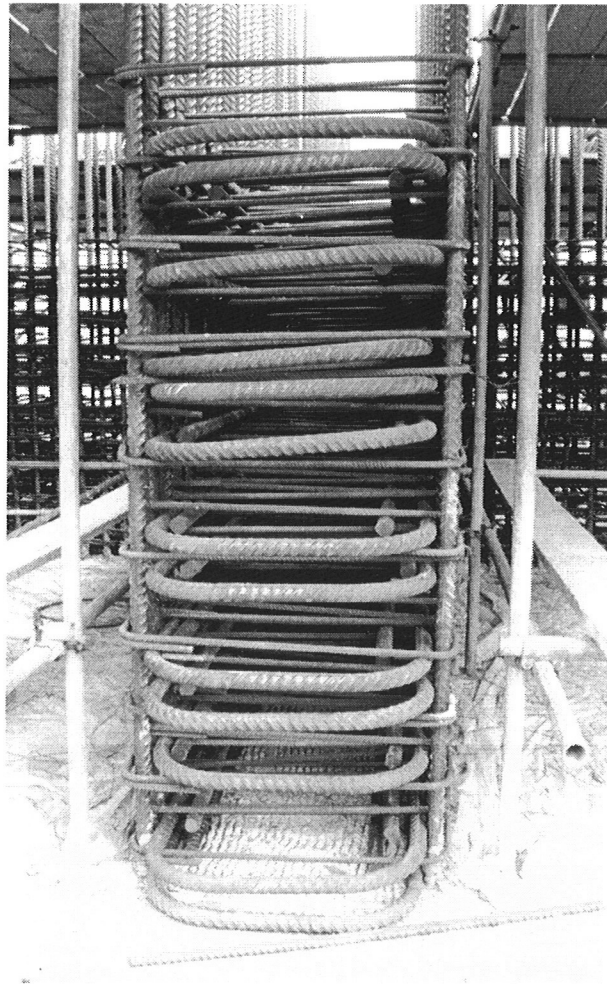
Reinforcement bars in the wall of a cell structure, before cement pouring.
